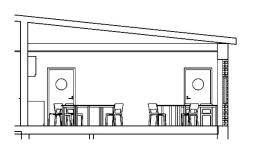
Architectural layout for fourth grade classrooms (1:200)
